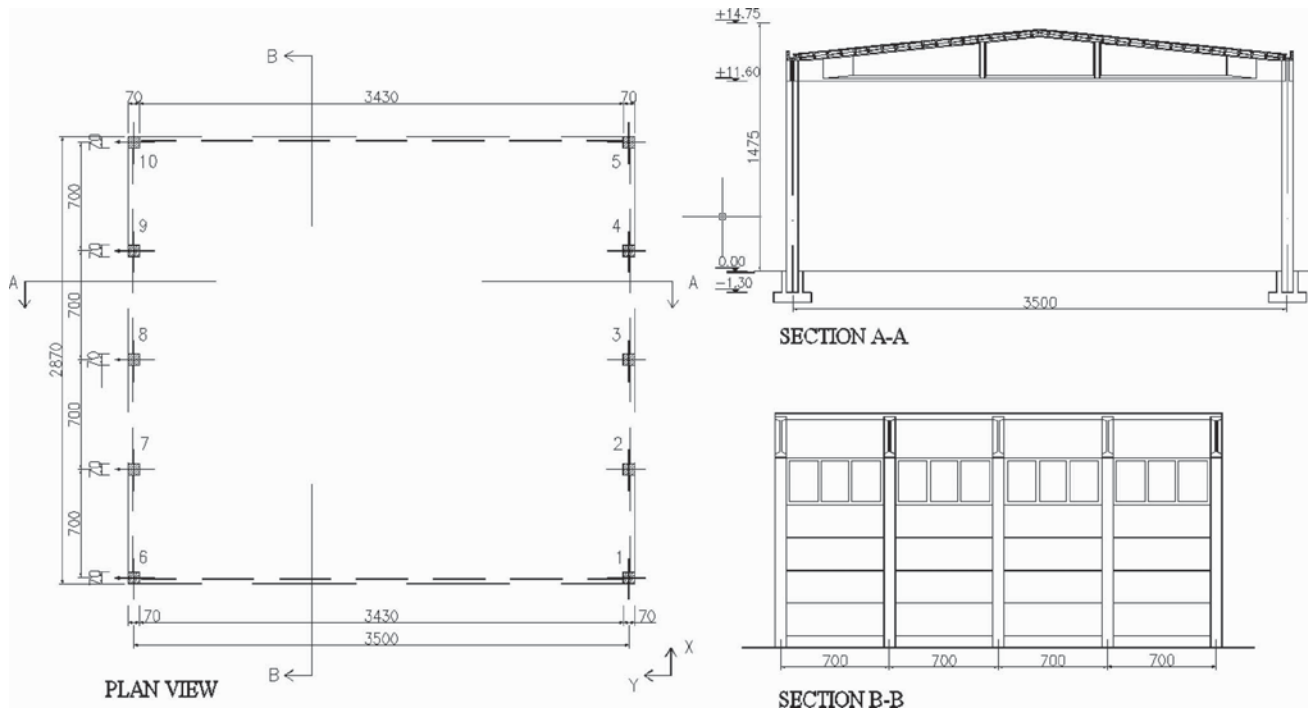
Plan view and transversal sections of the precast one-storey frame structure [m].
